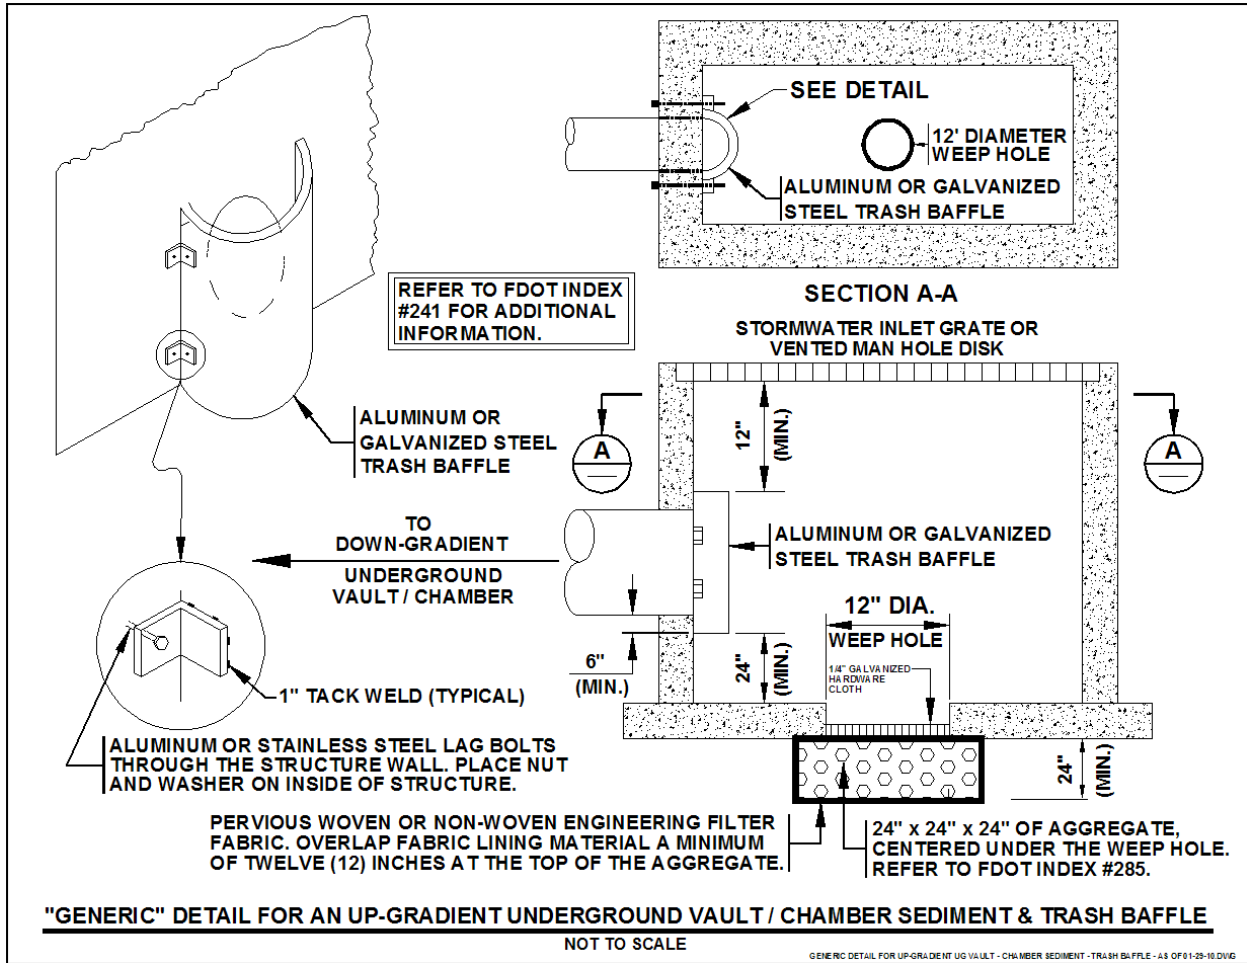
Generic Detail for an Up-Gradient Underground Vault/Chamber System Sediment & Trash Baffle
